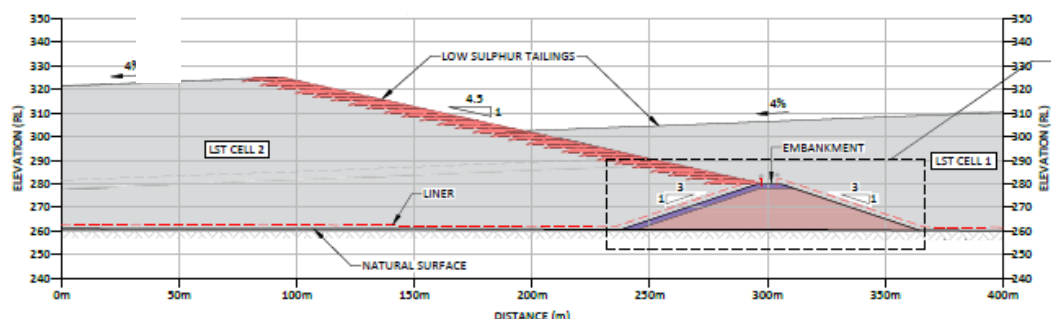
Typical section through the LS 1 & 2 dividing embankment
